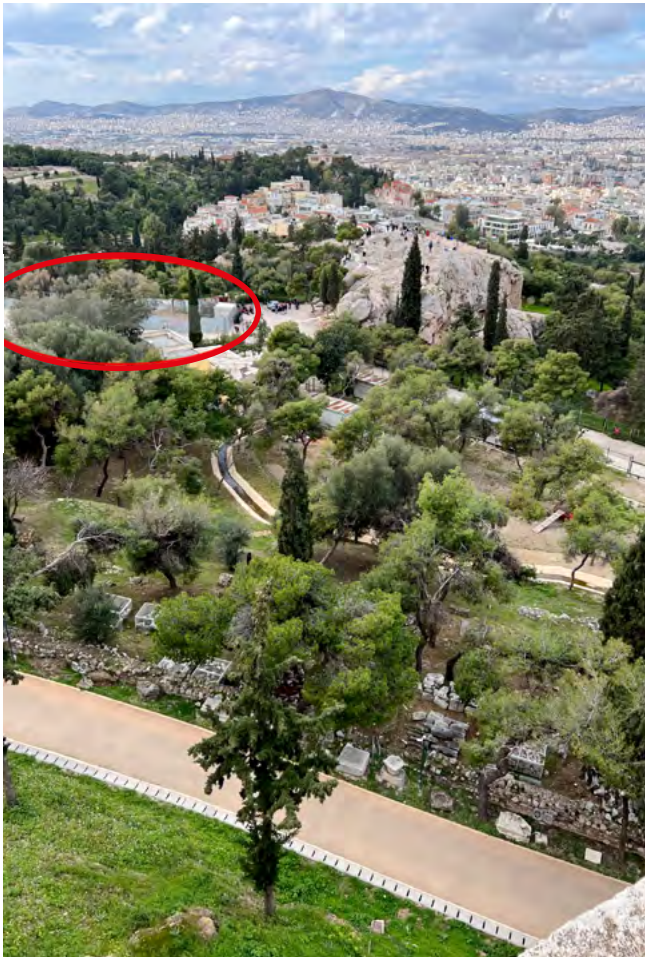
View from the northwest end of the Acropolis' northern wall, looking northwest. In the image, below: the Peripatos, lined with a covered drainage channel on the south, all constructed with reinforced concrete; in the middle, a winding drainage channel. The drainage network was completed in 2023. Above, in a red ellipse, the foundations of the new souvenir shop and, to the right, the rock of the Areopagus. Further up, the Pnyx and the Observatory. (2024)
